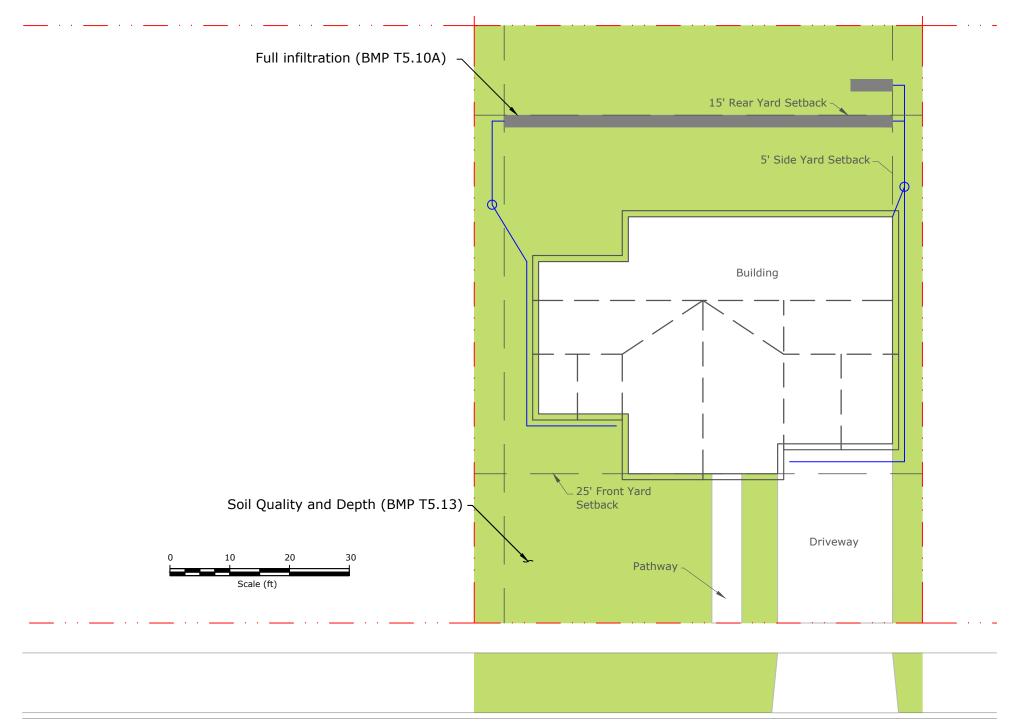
Scenario 3. Permanent Stormwater Site Plan - Typical Single-Family Residential Parcel, 2012 Requirements, Outwash Soils
